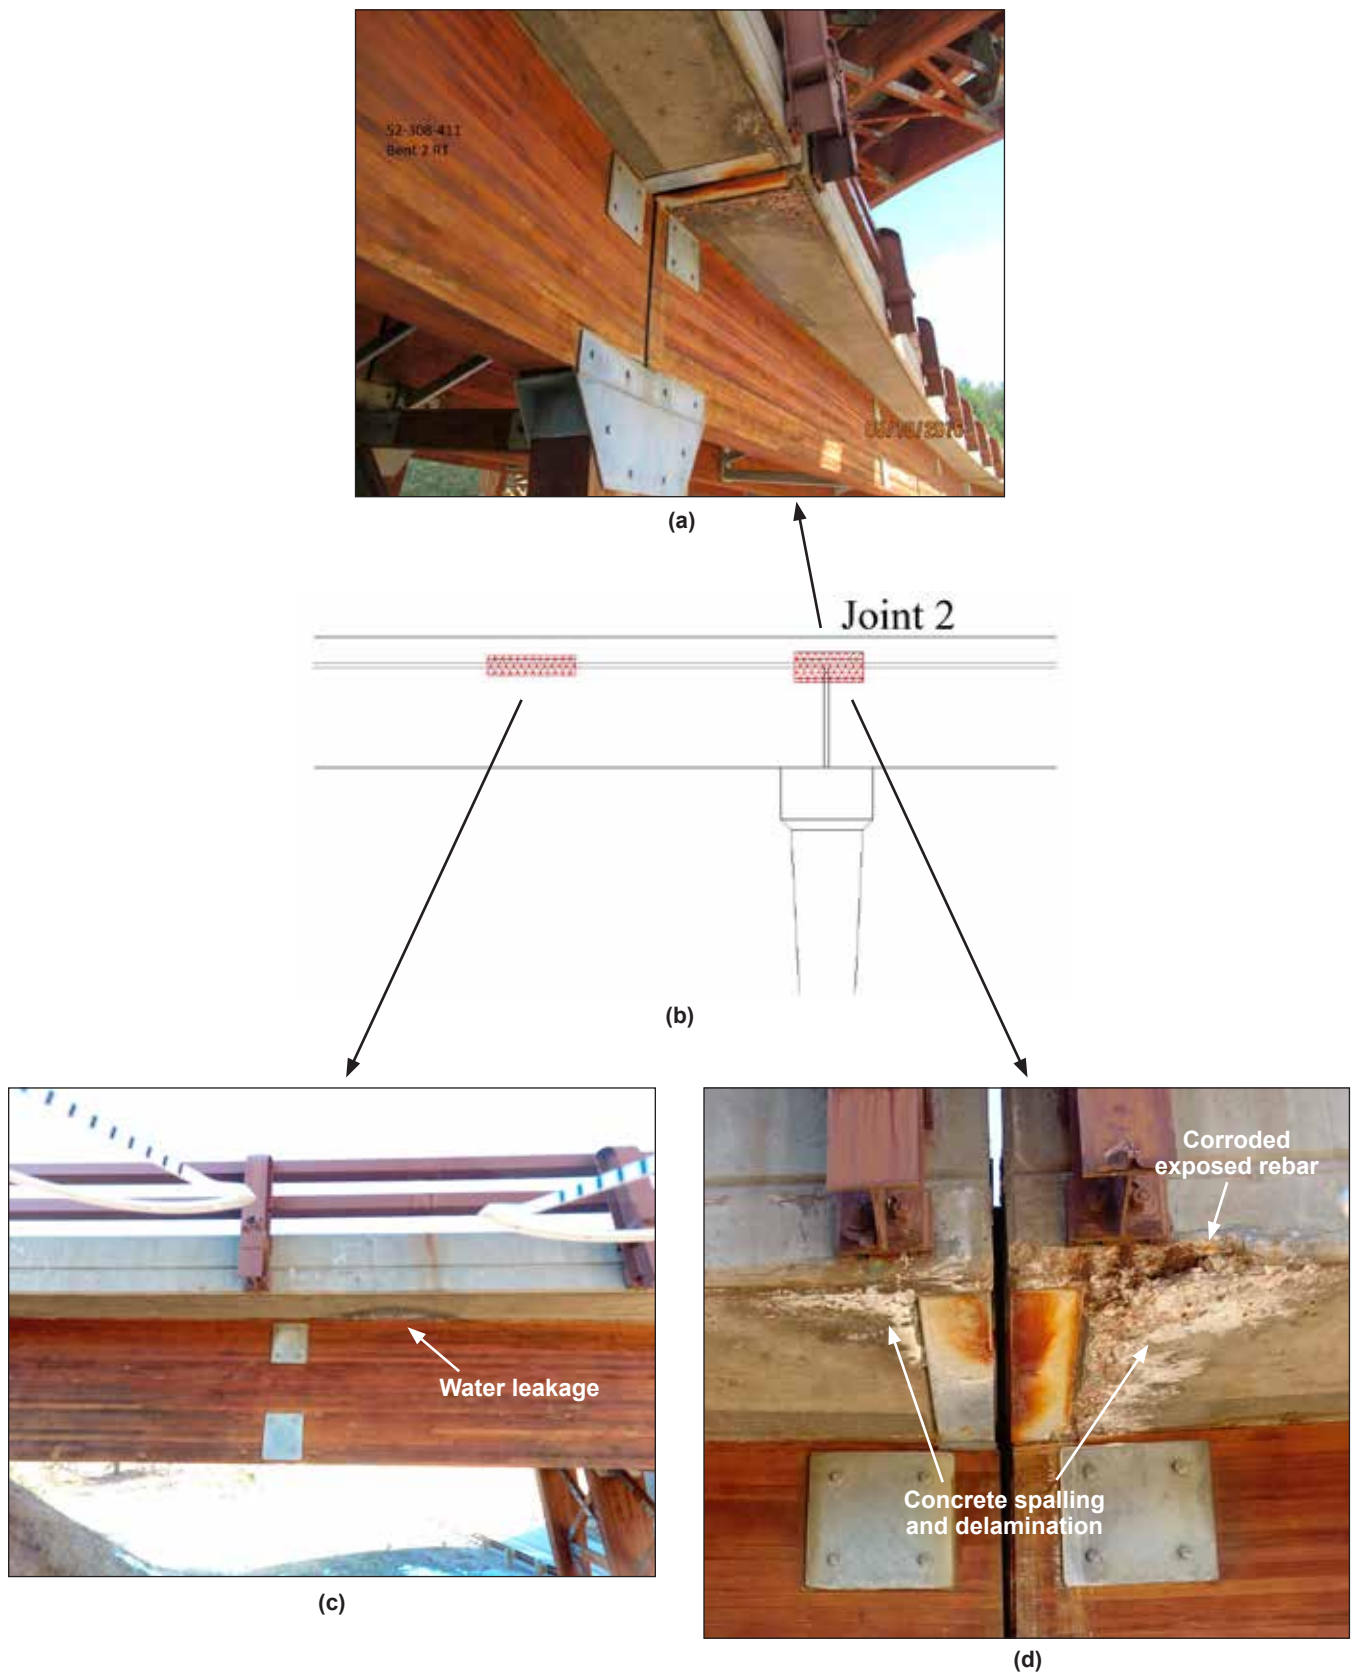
Sample damage on deck near Girder 4: (a) reference image taken during conventional inspection (used with permission from South Dakota Department of Transportation); (b) damage locations on girder; (c) water leakage under deck between Joints 1 and 2; (d) concrete spalling and corrosion with exposed rebar near Girder 4 at Joint 2.
